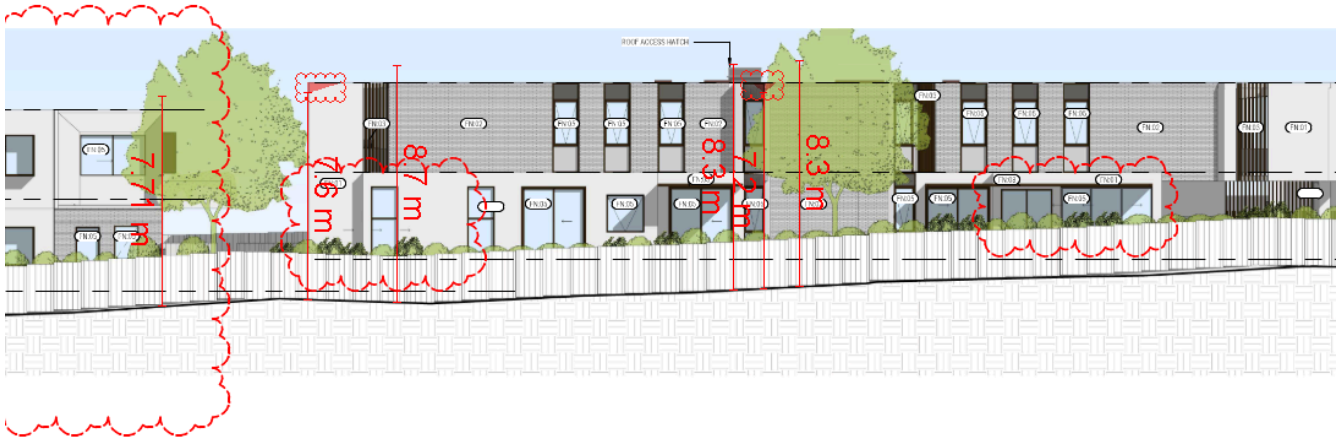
Building envelope breaches shaded and clouded red at the northwestern elevation.
